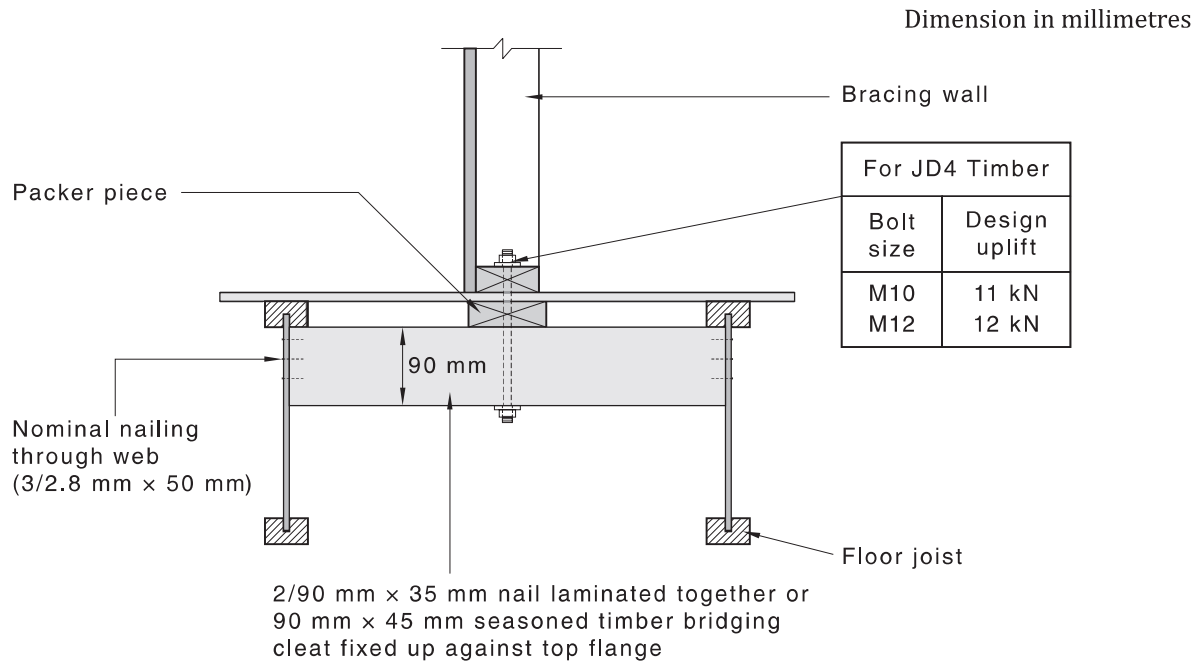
Equivalent z-clip detail to transfer bracing forces through internal walls
